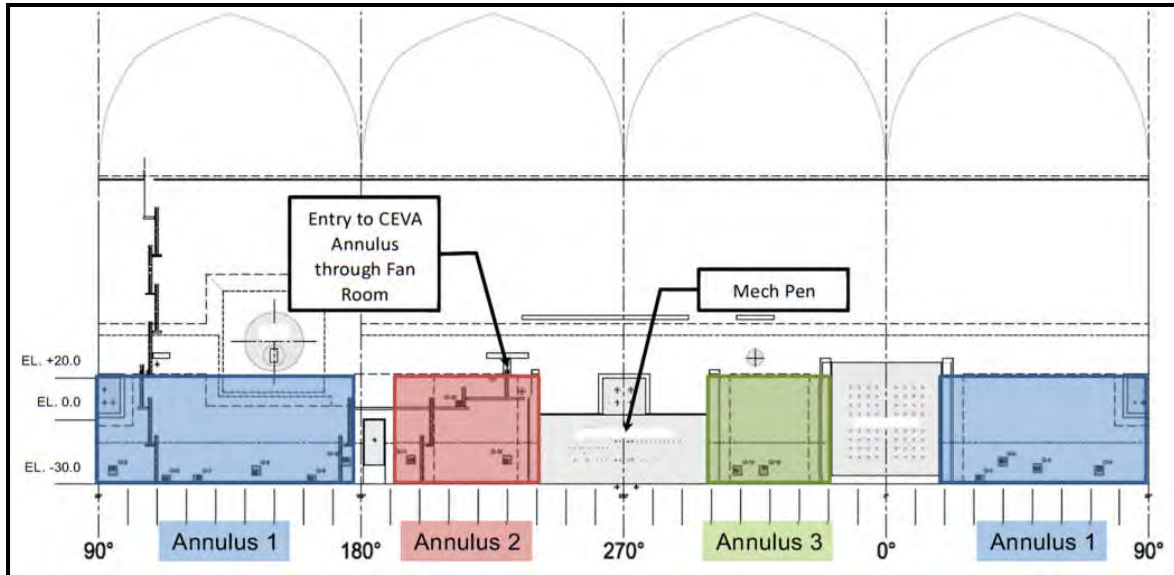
Seabrook Station Containment Enclosure Building - Exploded View
